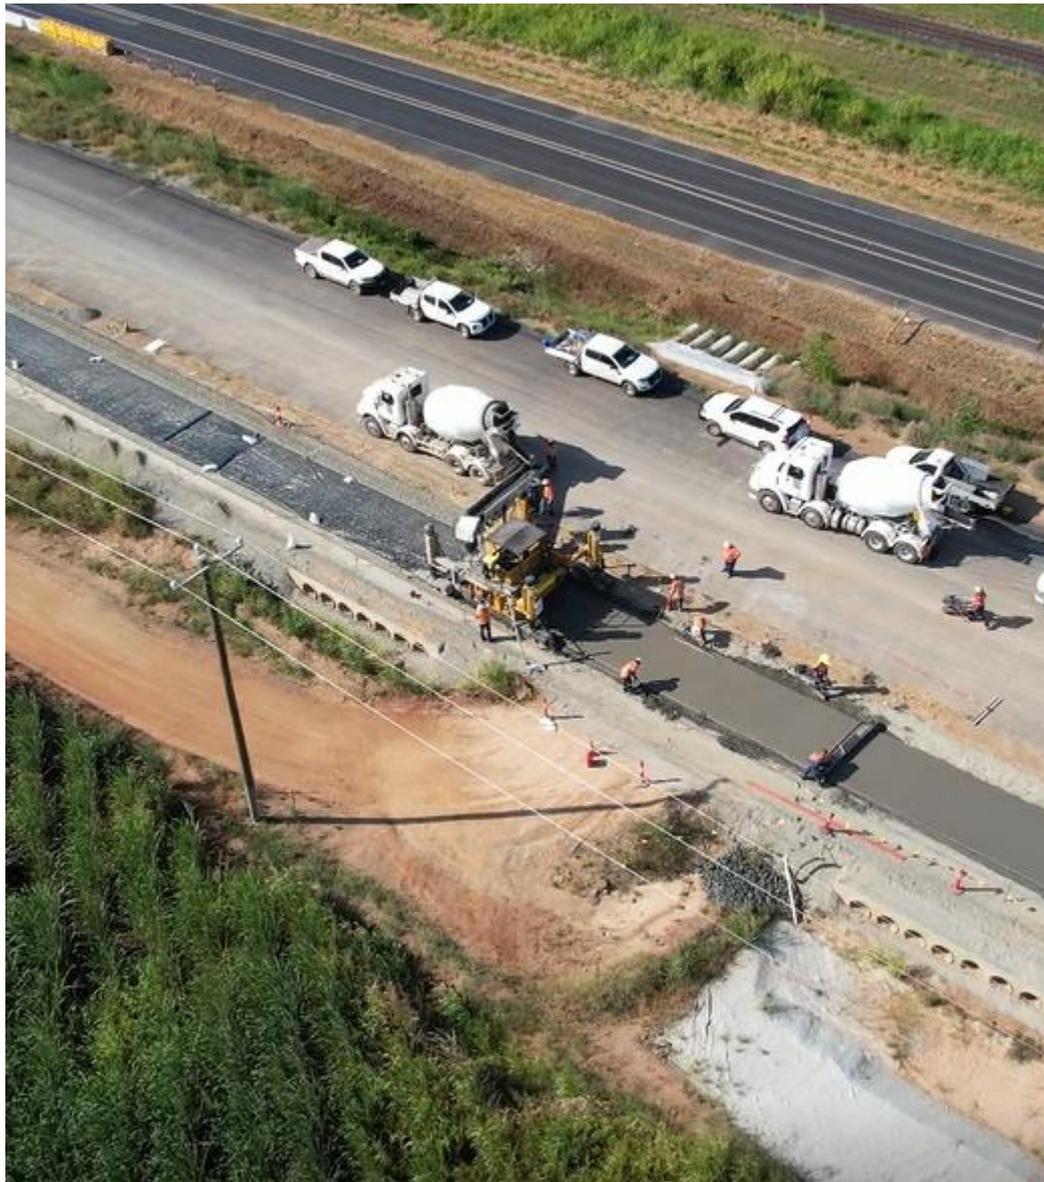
Cycleway Constructed with E-Mesh Reinforcement through a Paver
